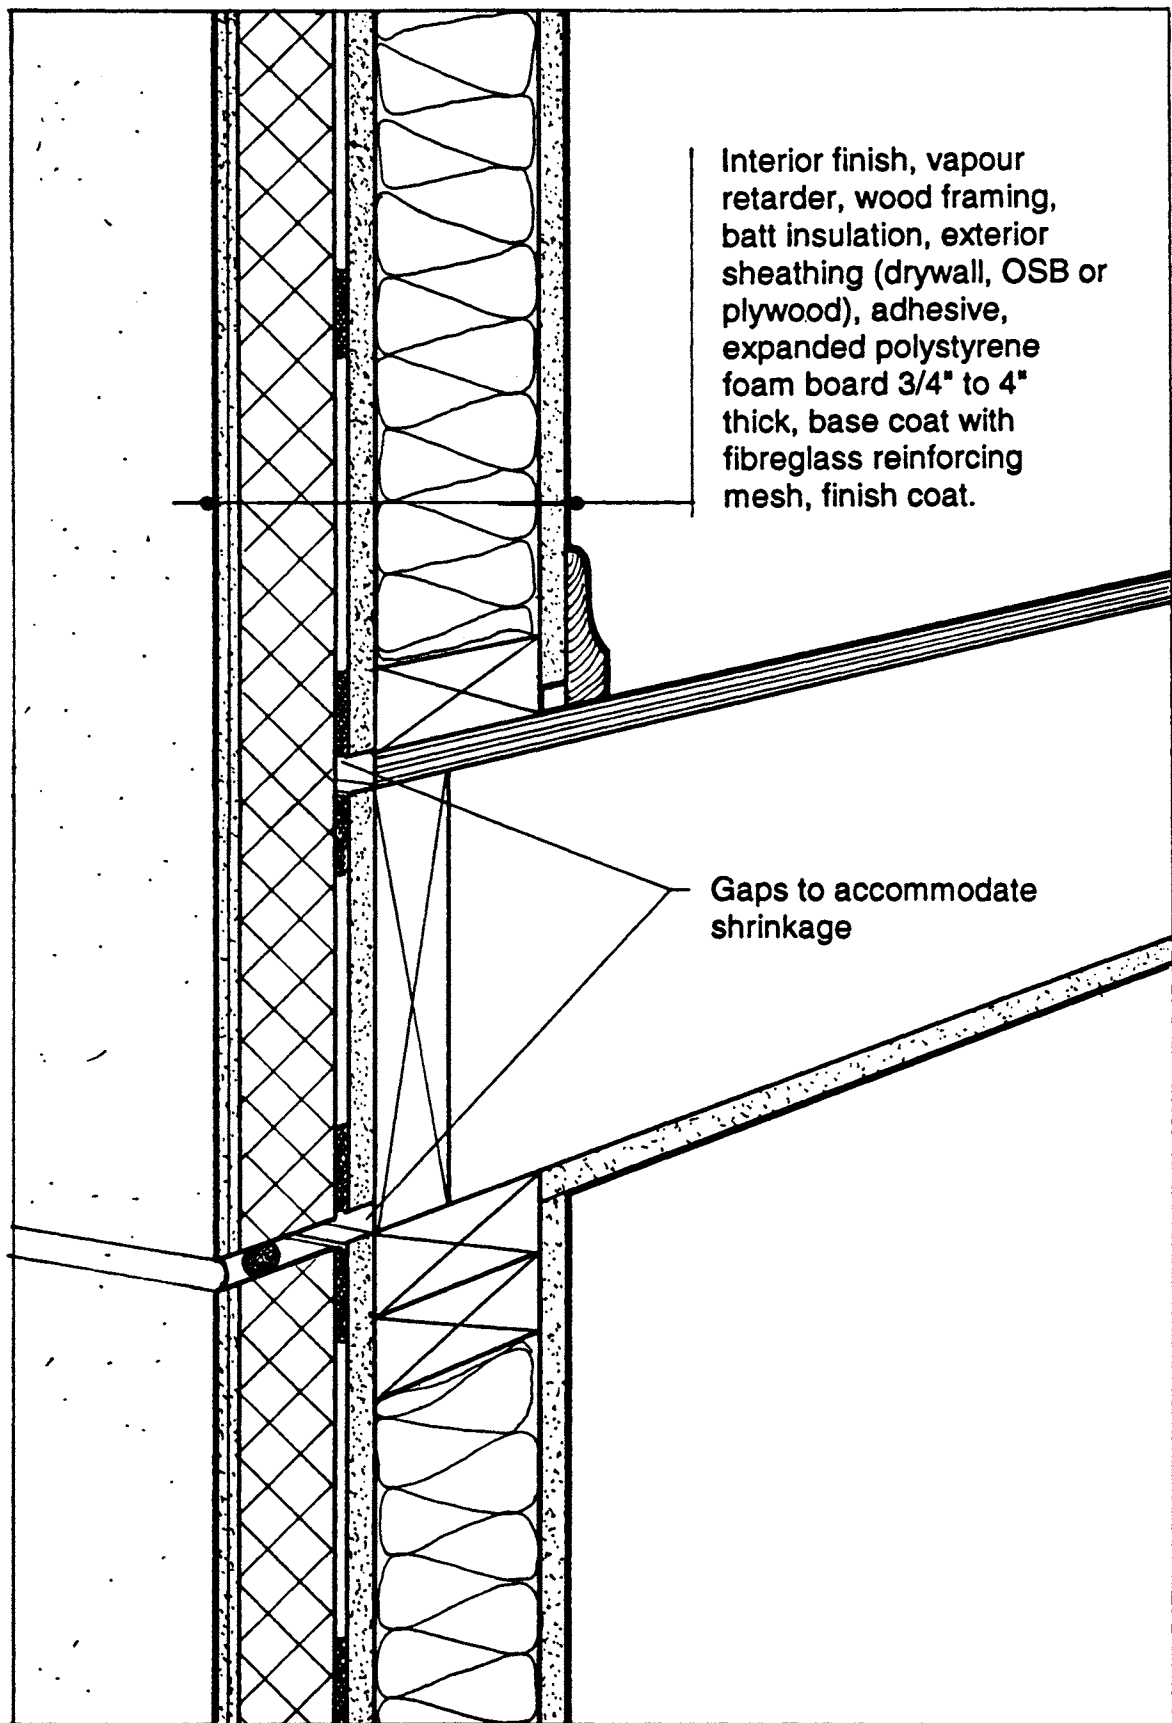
TYPICAL EIF SYSTEM APPLIED TO WOOD FRAMING
